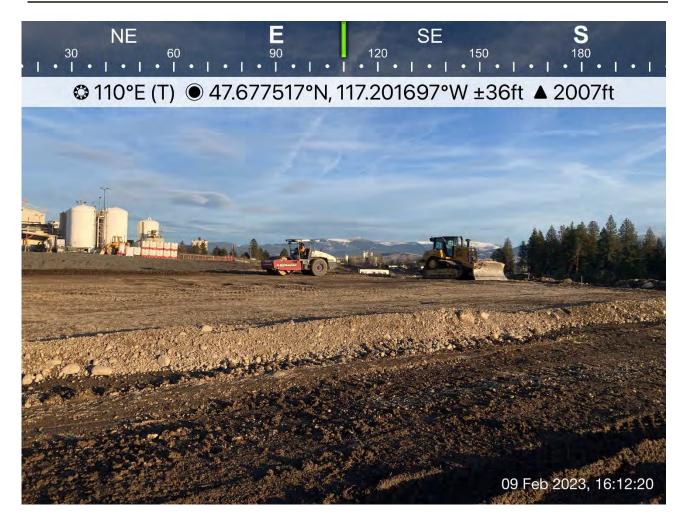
Transfer of excavated materials from the stockpile located near planned Excavation 4 to the former UPRR dross stockpile area to be spread and compacted.
